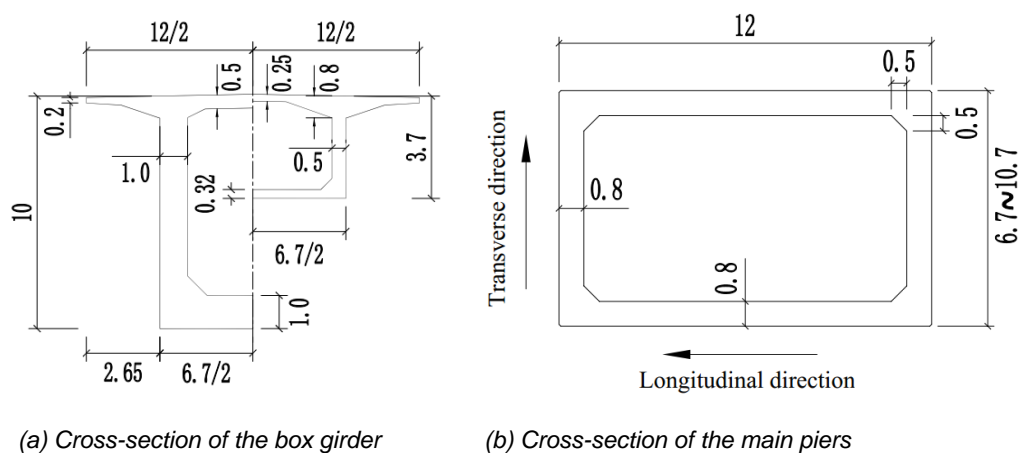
Cross-section for the box girder and hollow pier of Niulanjiang bridge
